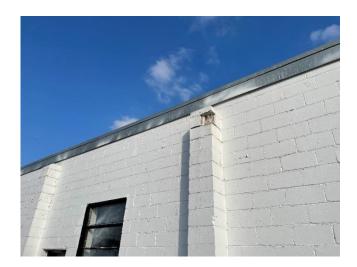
Spalled CMU at Pilasters
